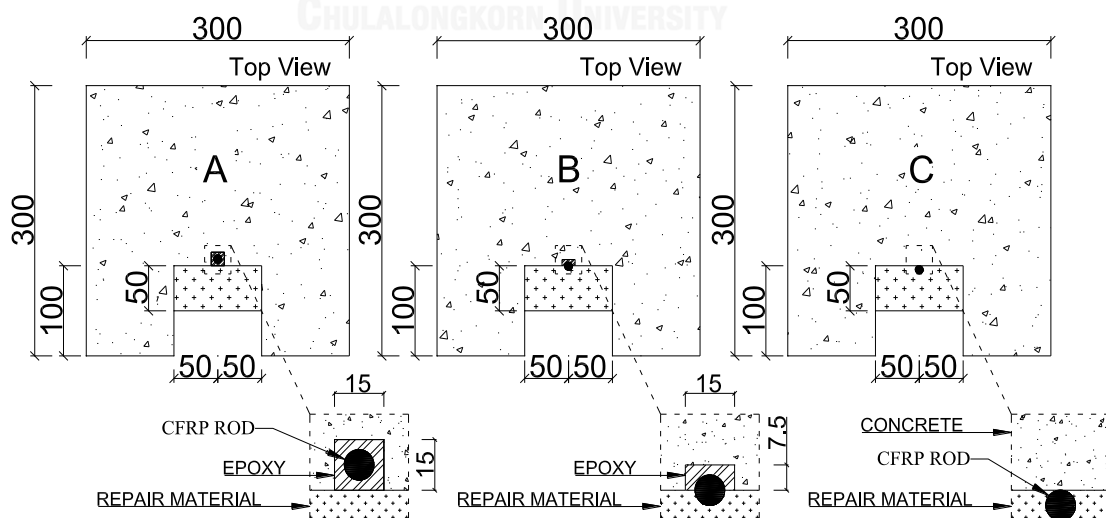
Different locations of CFRP rods in C-shaped specimens.
